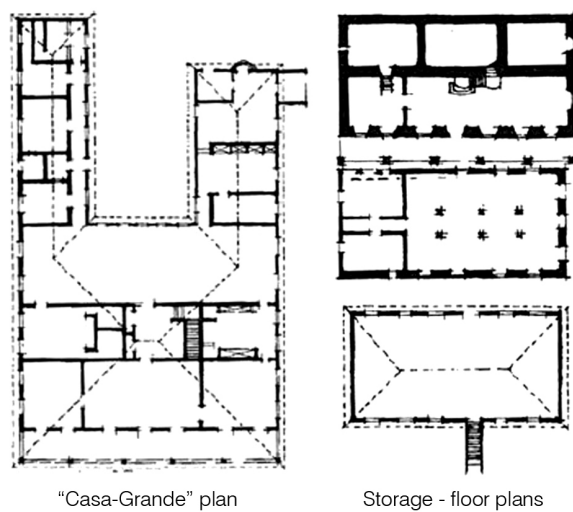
Planimetry and buildings of the Engenho, century XIX [14]
